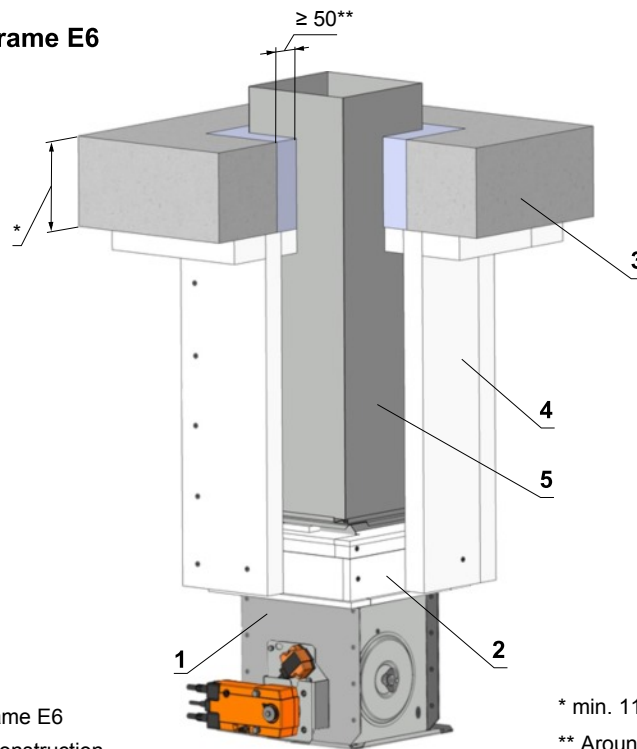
Outside solid ceiling construction - installation frame E6 with cement lime plates
